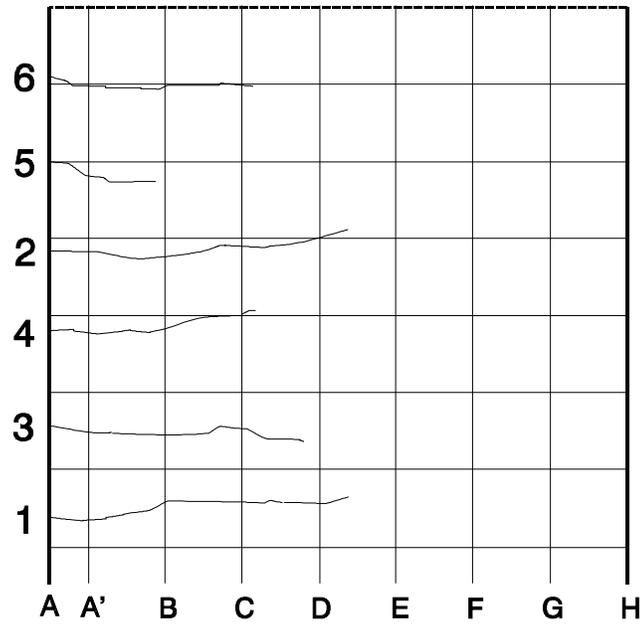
POJ-PU-54-TH cracking pattern on north face of pier at service load
